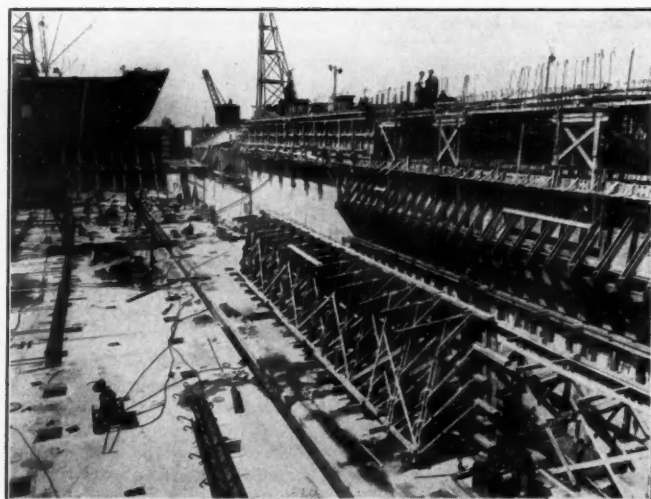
Travelling formwork for bottom lift of wall and formwork panels for upper portion.
